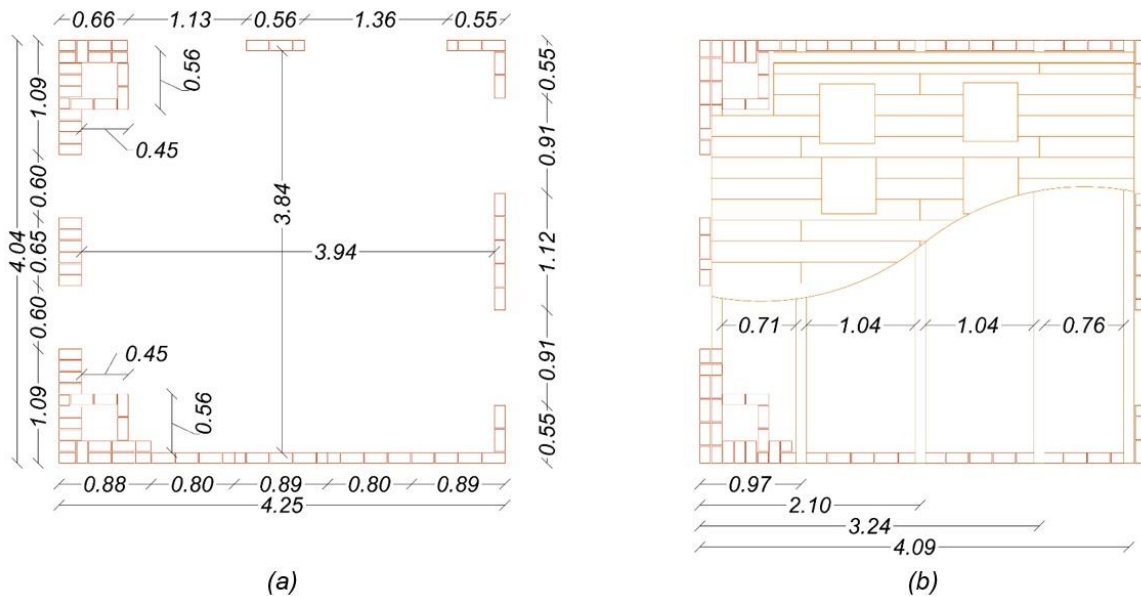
Full-scale building prototype: (a) ground-floor plan [m]; (b) first-floor plan [m] [4, p. 5]
